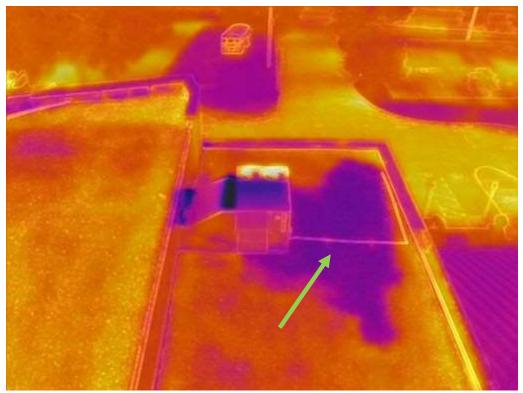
Typical view of thermal tracing indicative of standing water around air handling unit (RHTP-5 at R2)
